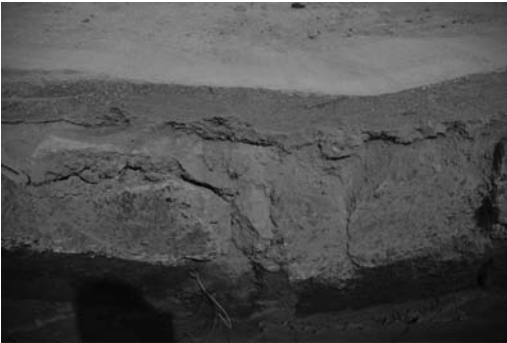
Close-up of failure zone in MRC-W trench.
